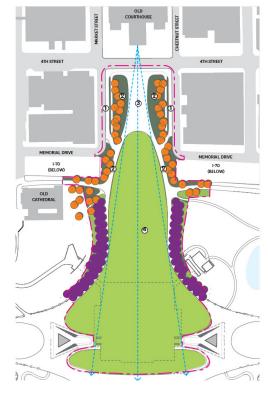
Alternative 2 West Gateway (Source: MVVA)
